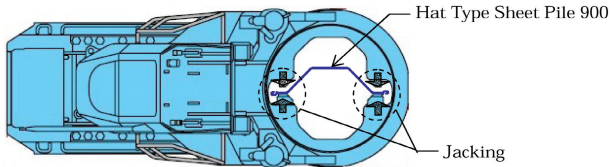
Hydraulic jacking machine for Hat-Type Sheet Pile 900
